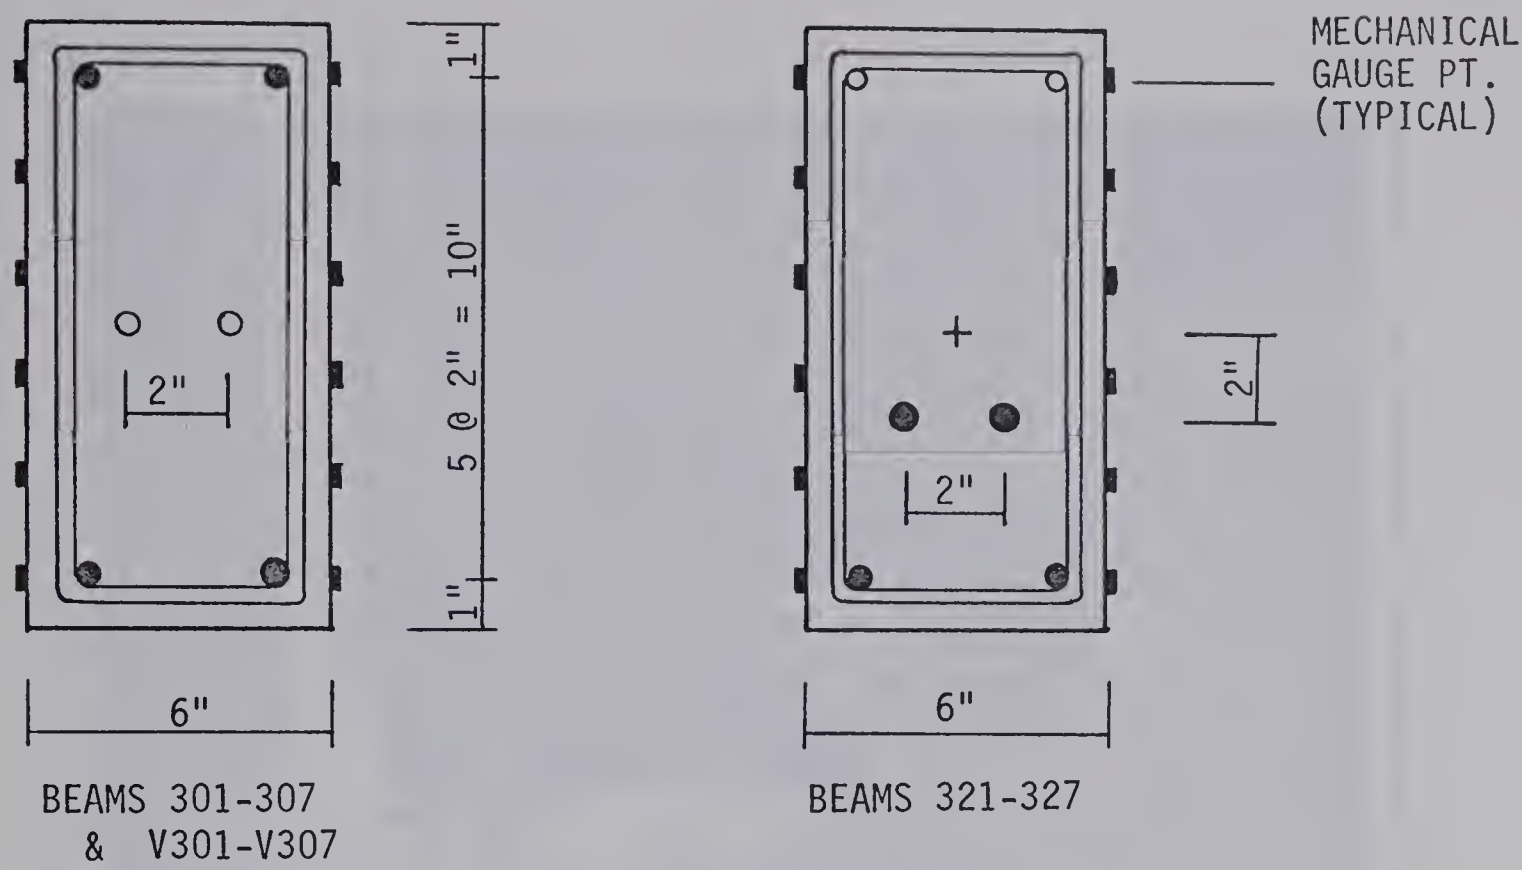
TYPICAL SPECIMEN (BEAMS OF GROUPS I & II)
